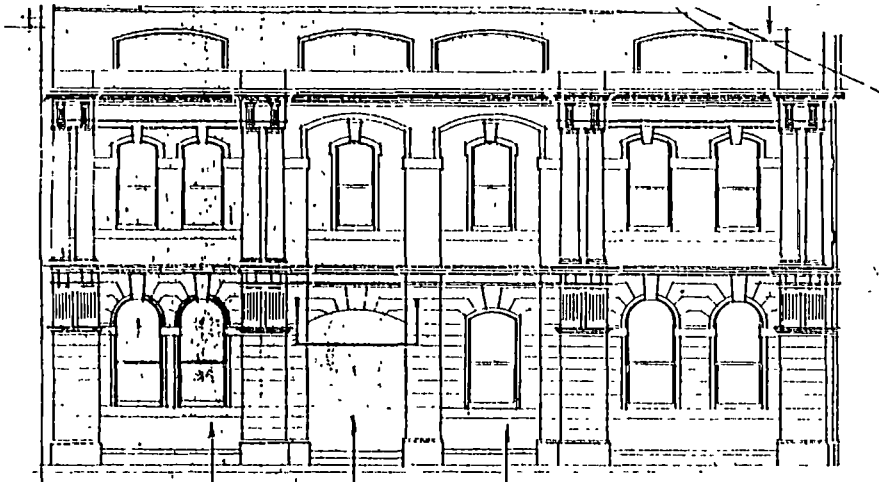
Proposed Franklin Wharf facade of the former Marine Board Building, 2 Elizabeth Street
